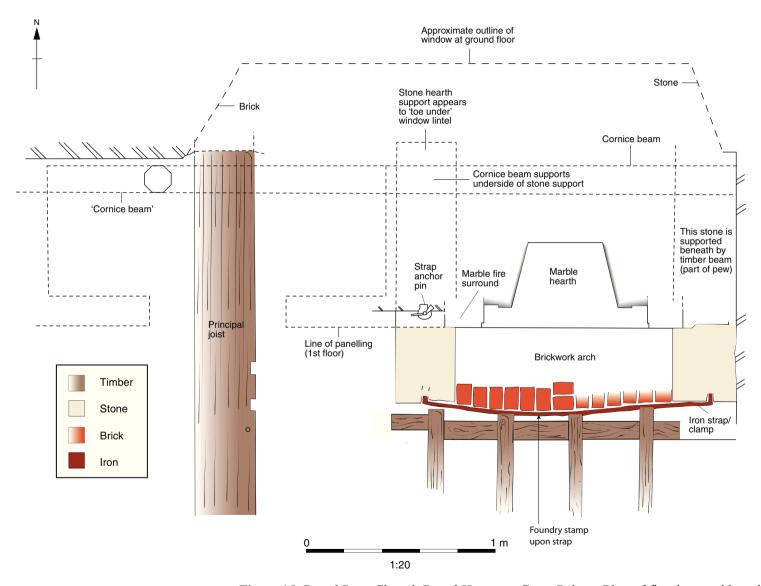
Royal Pew, Chapel, Royal Hampton Court Palace: Plan of fireplace and hearth area within winter pew
